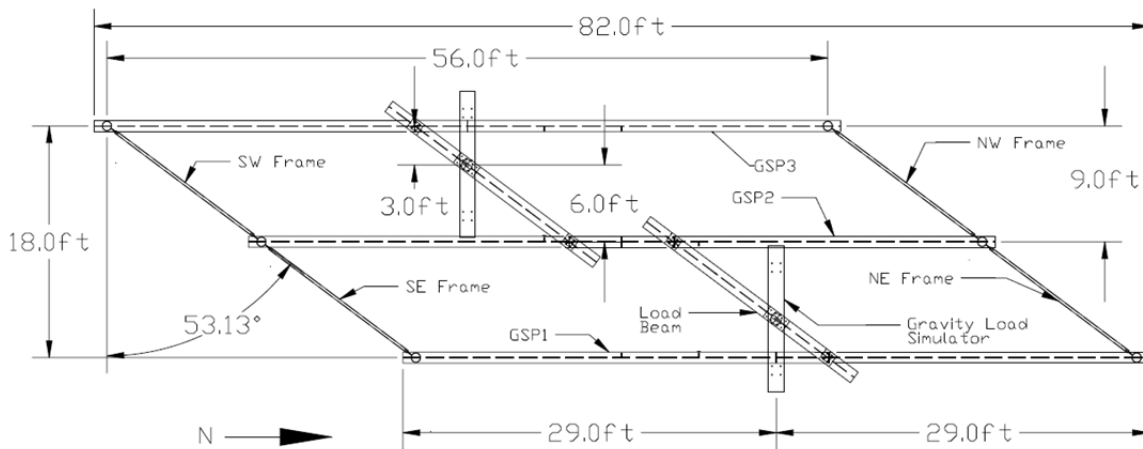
Three girder test specimen plan view (no intermediate frames)
